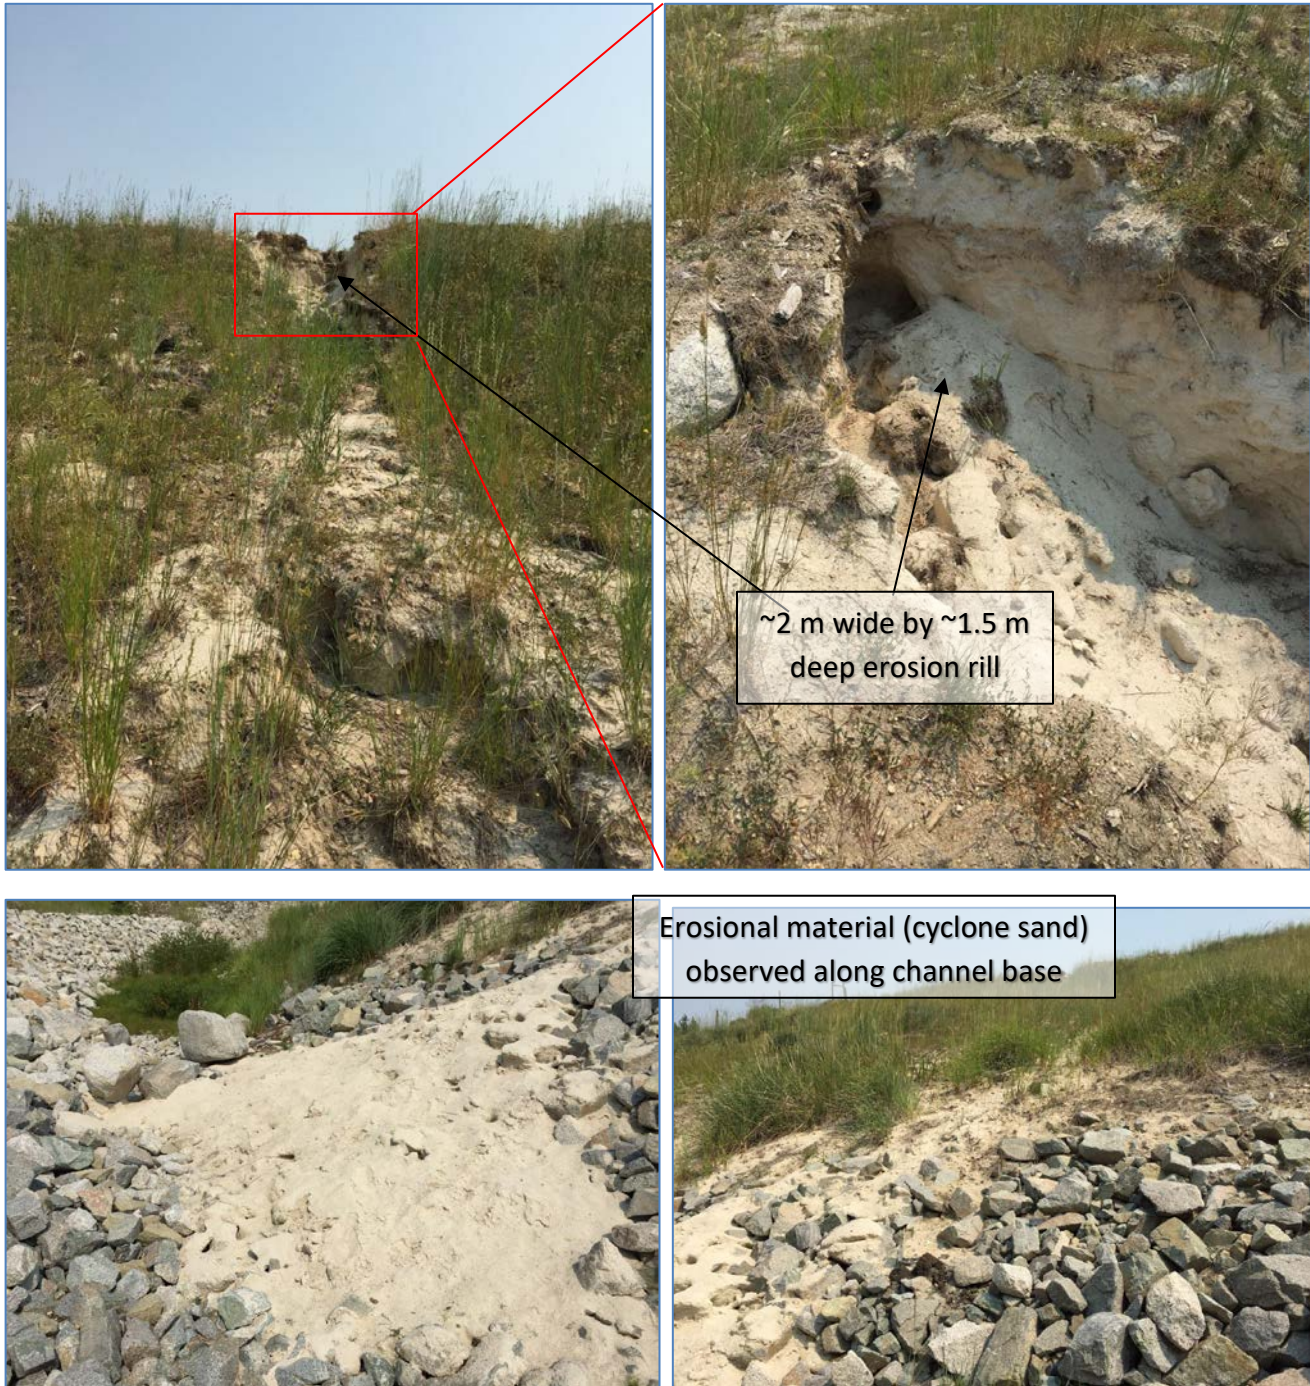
Spillway channel – extension of riprap section (TRJ-2018-20)
